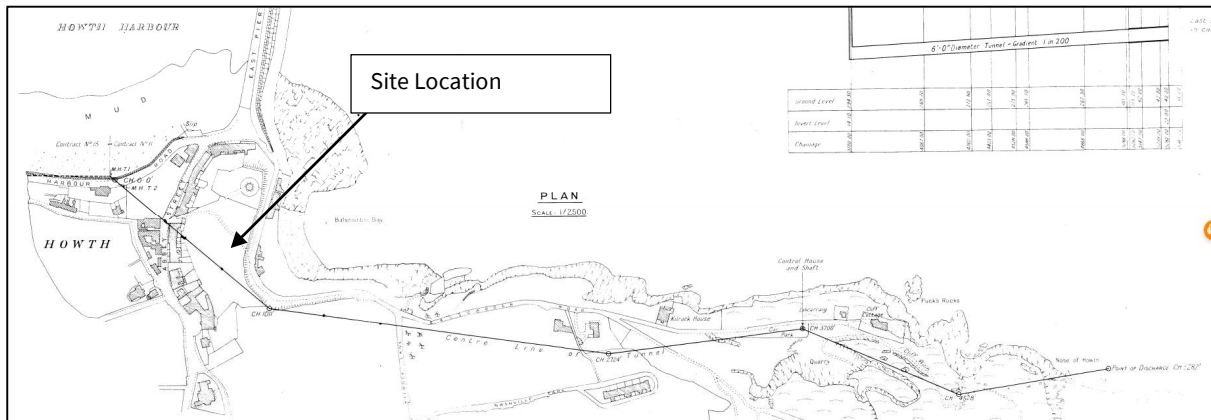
North Dublin Drainage Scheme - Howth Tunnel
